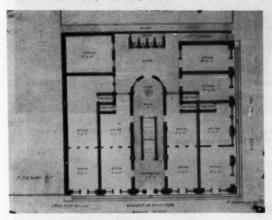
Ground plan of a project for an office building at 6th and Walnut Streets, Philadelphia. (The Historical Society of Pennsylvania)
